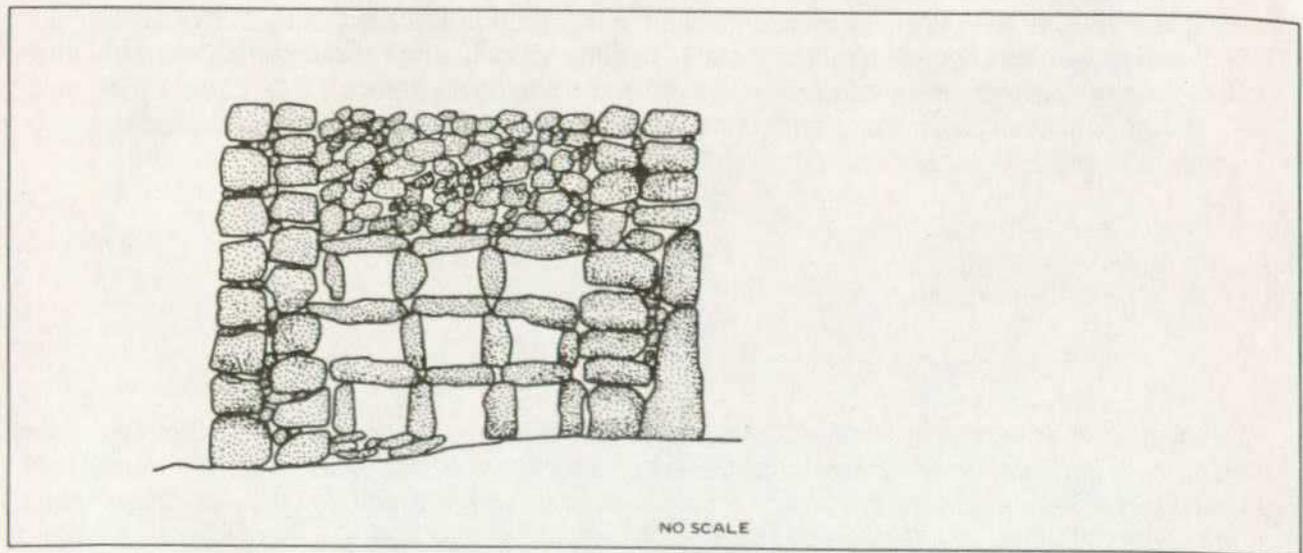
SCHEMATIC CROSS SECTION OF GREAT WALL OF PU'UHONUA, SHOWING OPEN PAO CONSTRUCTION.
